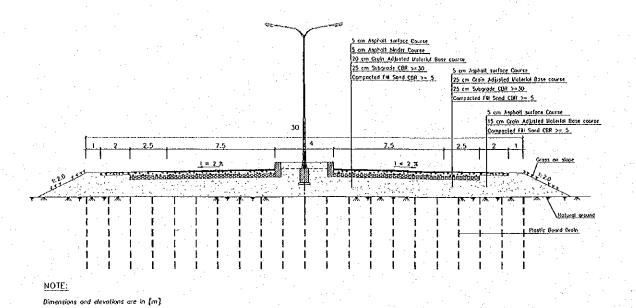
Typical Cross Section of Access Road to Cai Mep Site
